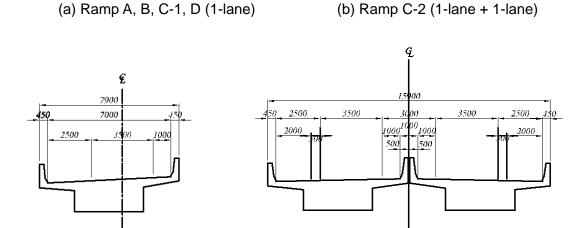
Typical Cross Section of Ramps in Kelanithissa Junction
